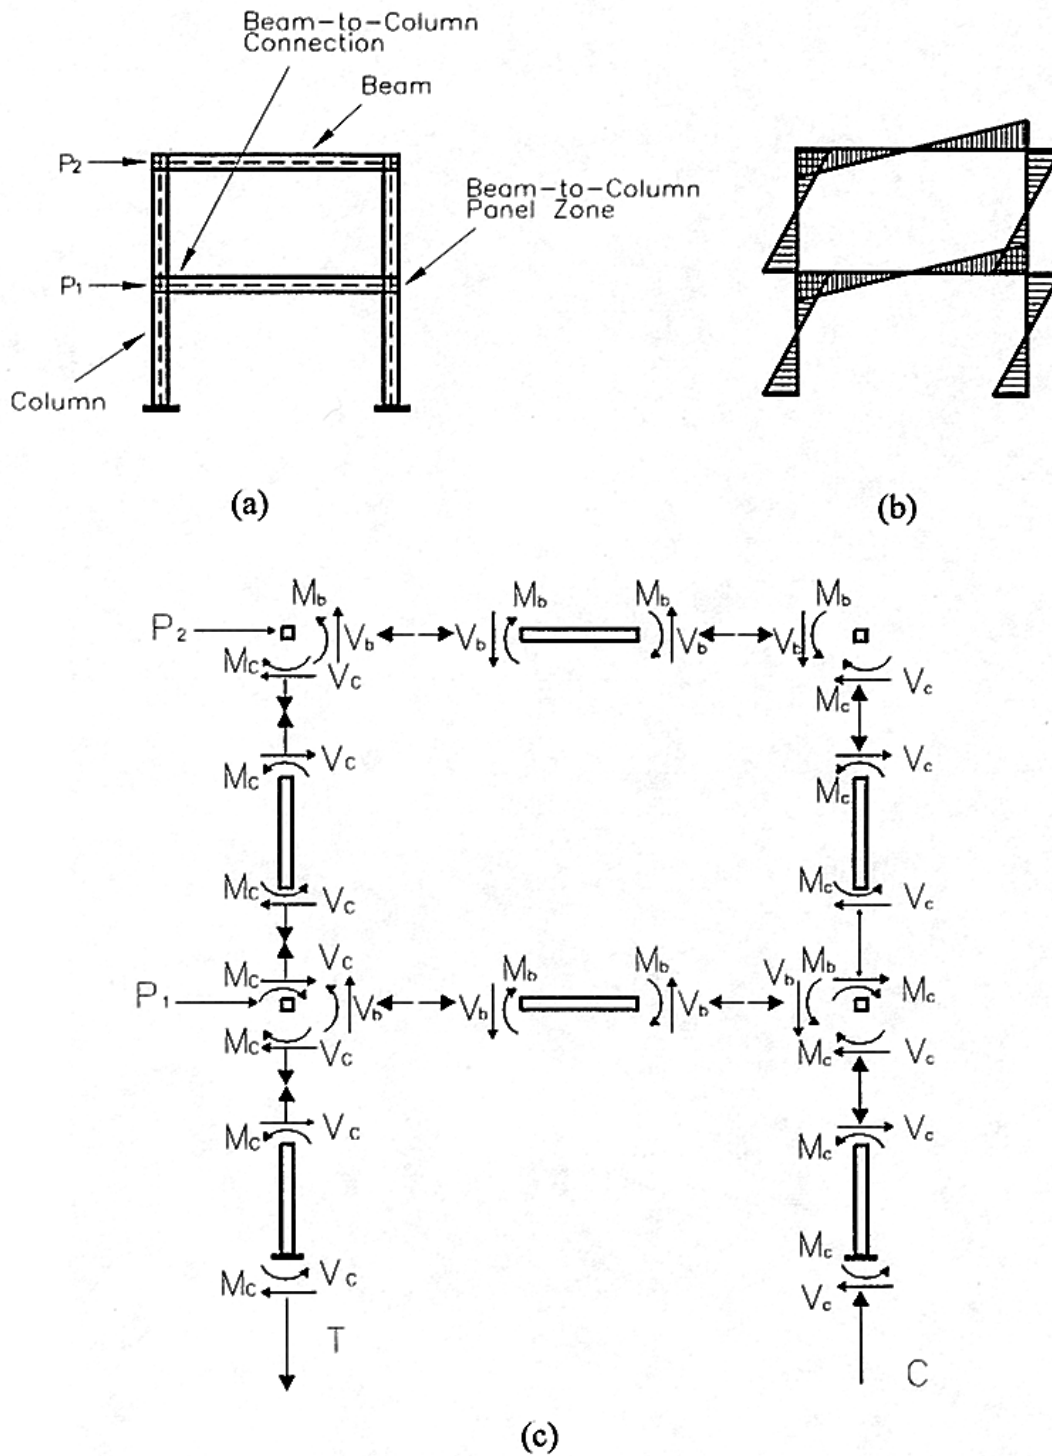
(a) Geometry considering finite dimensions of members, (b) Typical moment diagram under lateral loading, and (c) Corresponding member forces on beams, columns, and panel zones
